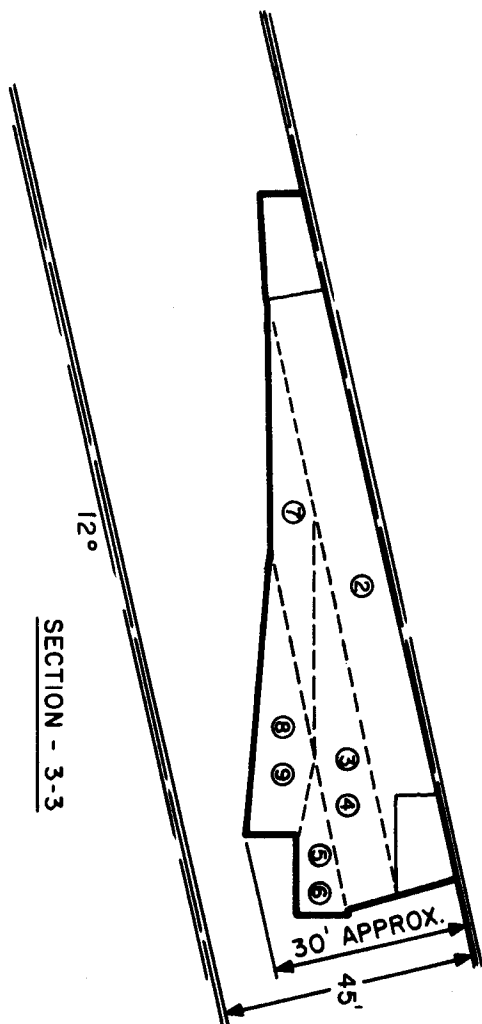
SECOND PHASE OF FLOOR COAL EXTRACTION, BALMER NORTH MINE
